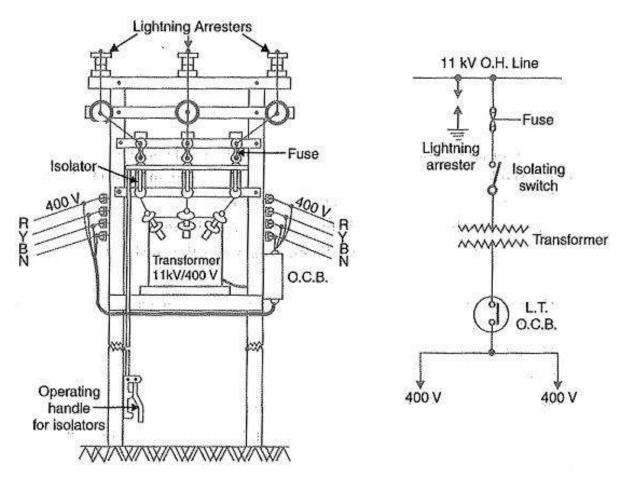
Layout and schematic connections of Pole mounted substation.
